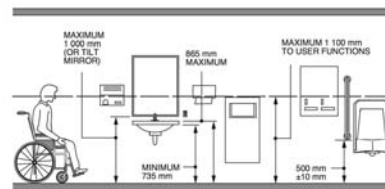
Suggested Toilet Room Layouts
